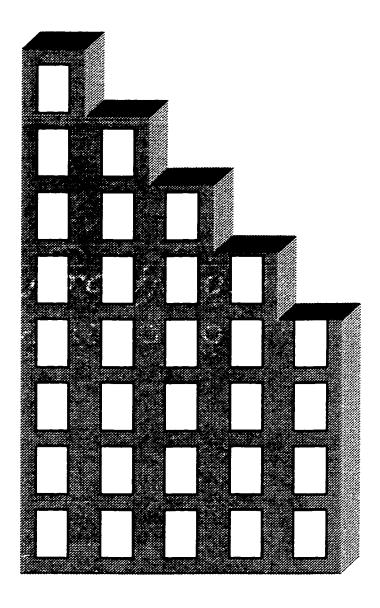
A Typical Stair Step Building. In this example, the building height would be calculated at six stories tall because there are eight stories on the left side of the building and four stories on the right side.
